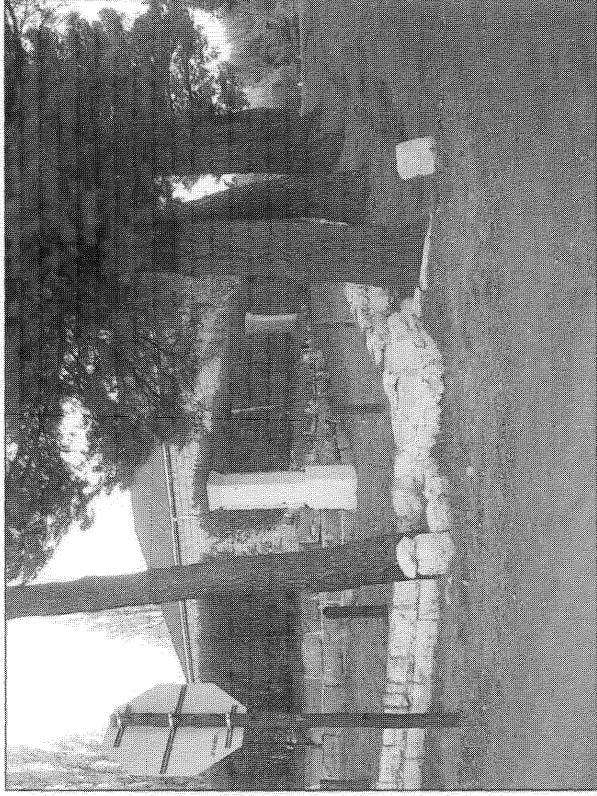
Sand stone pavement kerb on the corner of Church and Muller Streets.
